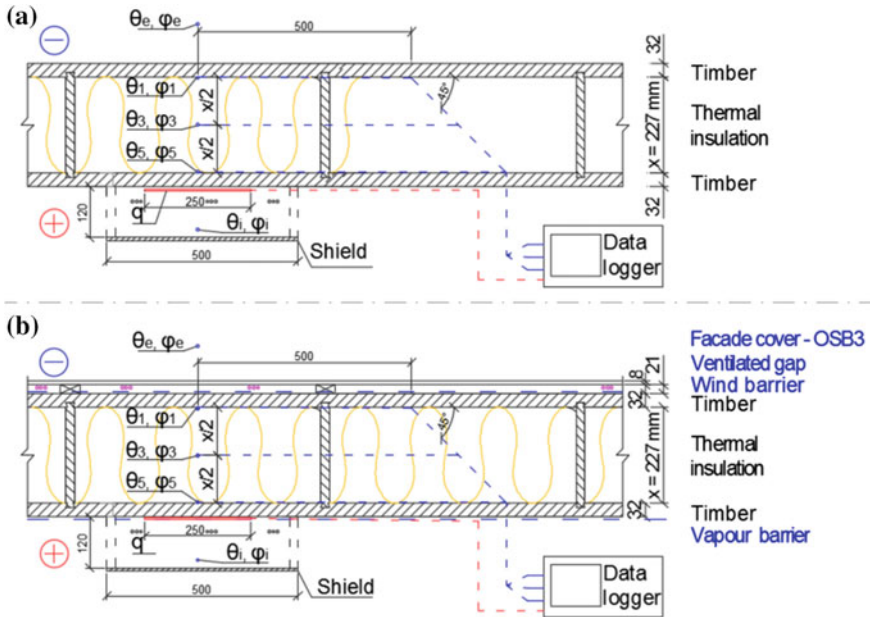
a The wall structure in the first period of testing; b The wall structure in the second period of testing
